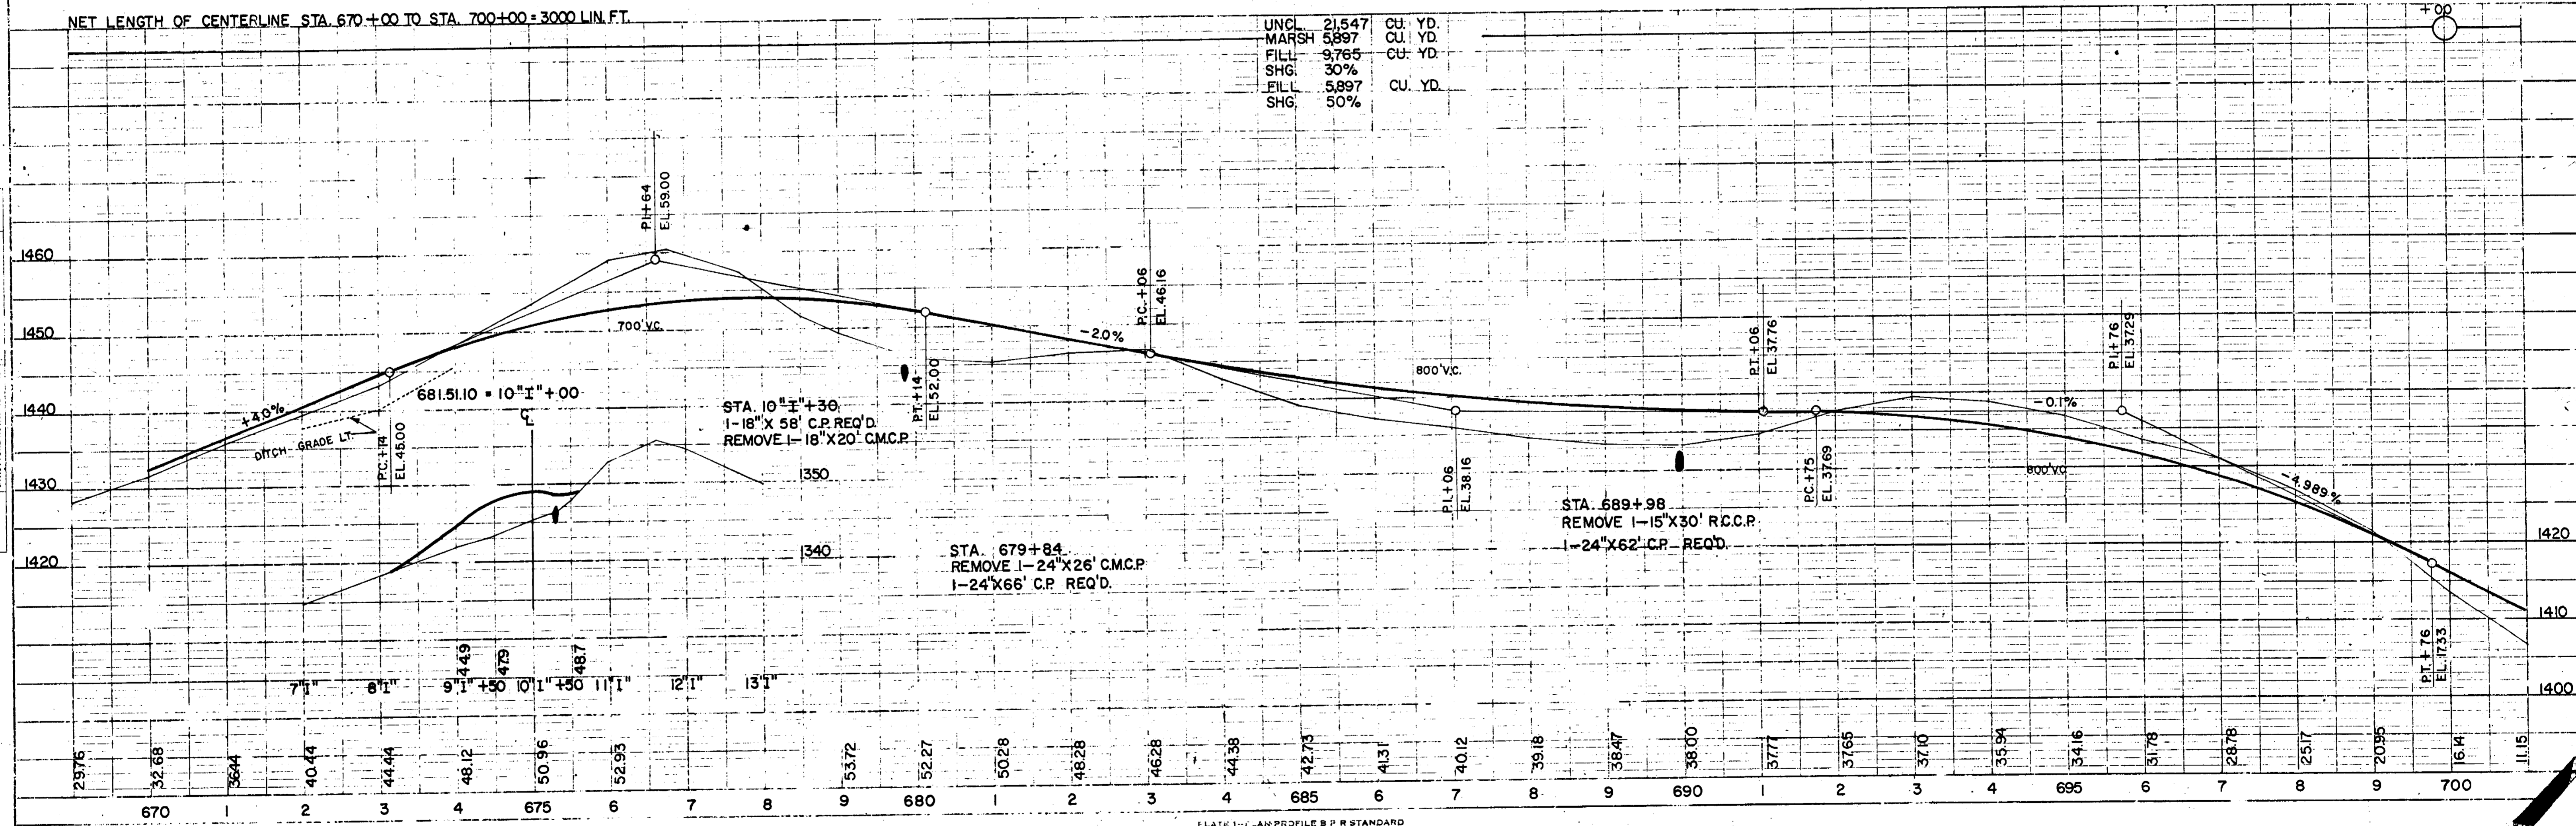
PLAN PROFILE B.P.R. STANDARD
